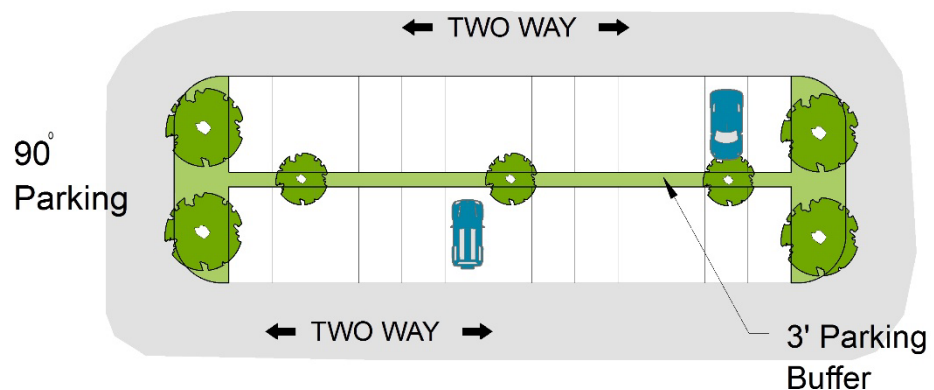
Parking Buffer Requirement for 90-Degree Parking
